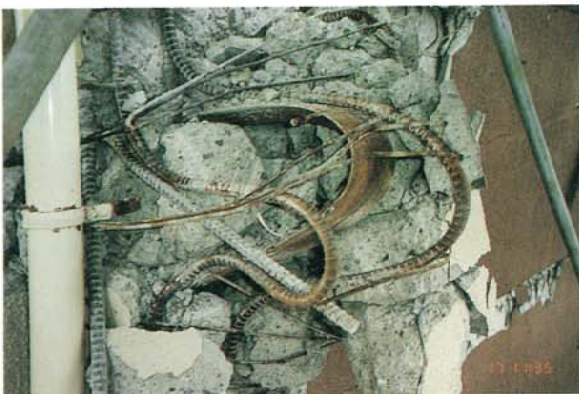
Failure of SRC Column with Built-up Steel
